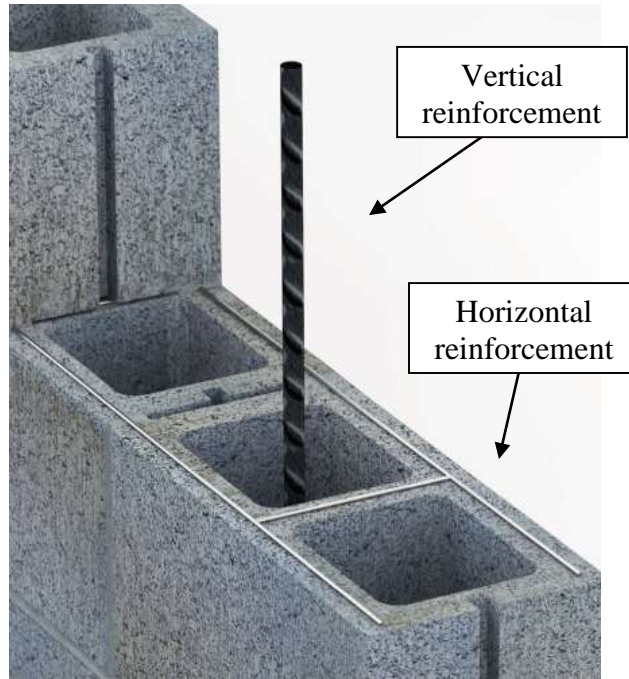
Horizontal and vertical steel reinforcement in a reinforced masonry wall (Image credit: John Maniatis)
